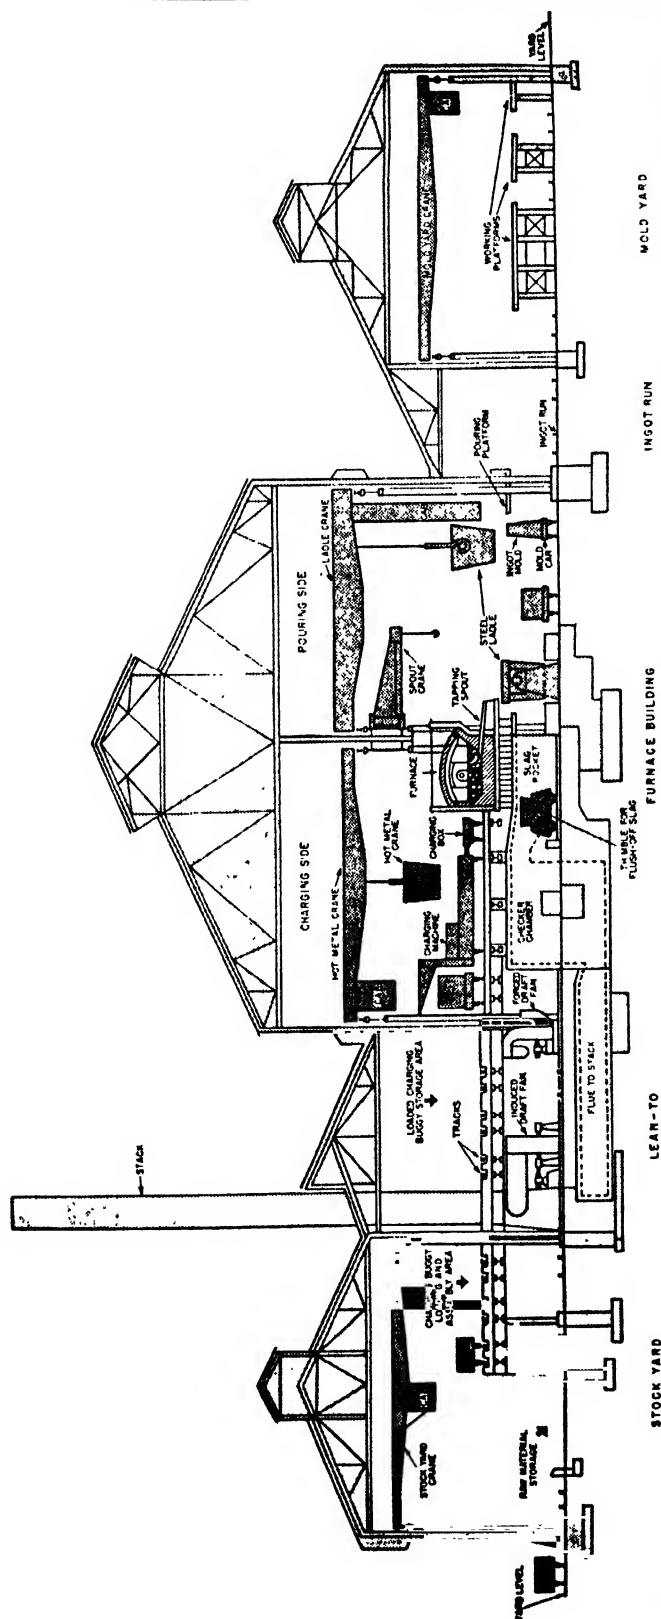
Diagrammatic cross-section of a modern open-hearth plant, showing the relative locations and sizes of the various buildings and the disposition of the chief operating units required for charging and operation of the furnace and disposition of the finished steel.
